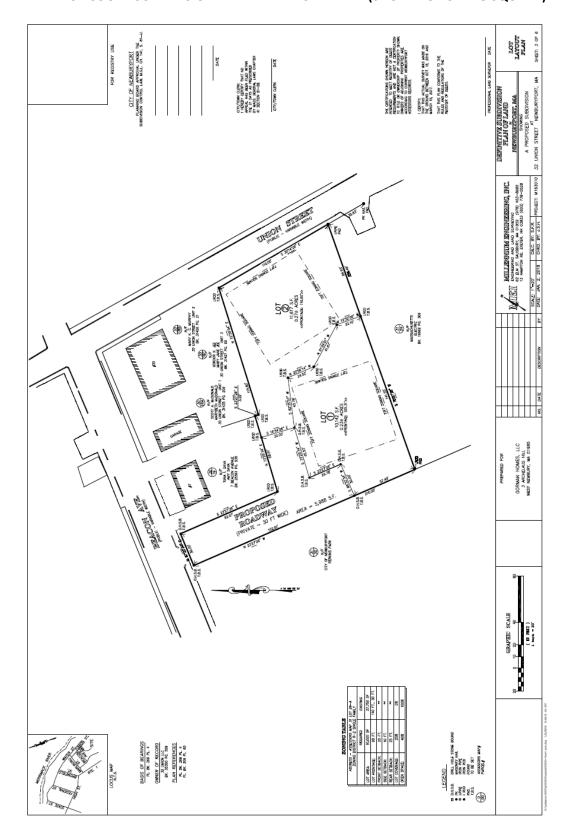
PROPOSED COURT SUBDIVISION PLAN WITH A WAIVER (SHOWING HOUSE LOCATIONS)
